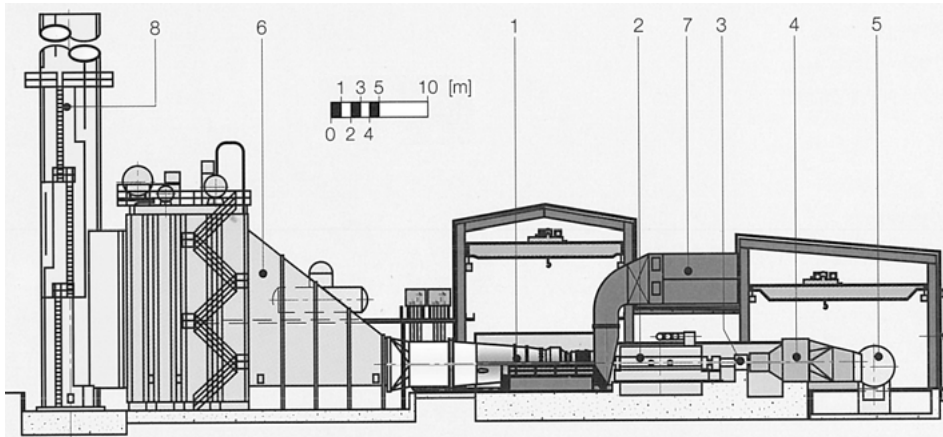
Combined-cycle power plant KA26-1 with single shaft GT and a triple-pressure steam cycle: 1 – gas turbine, 2 – generator, 3 – clutch, 4 – steam turbine, 5 – condenser, 6 – HRSG, 7 – air intake, 8 – exhaust stack
